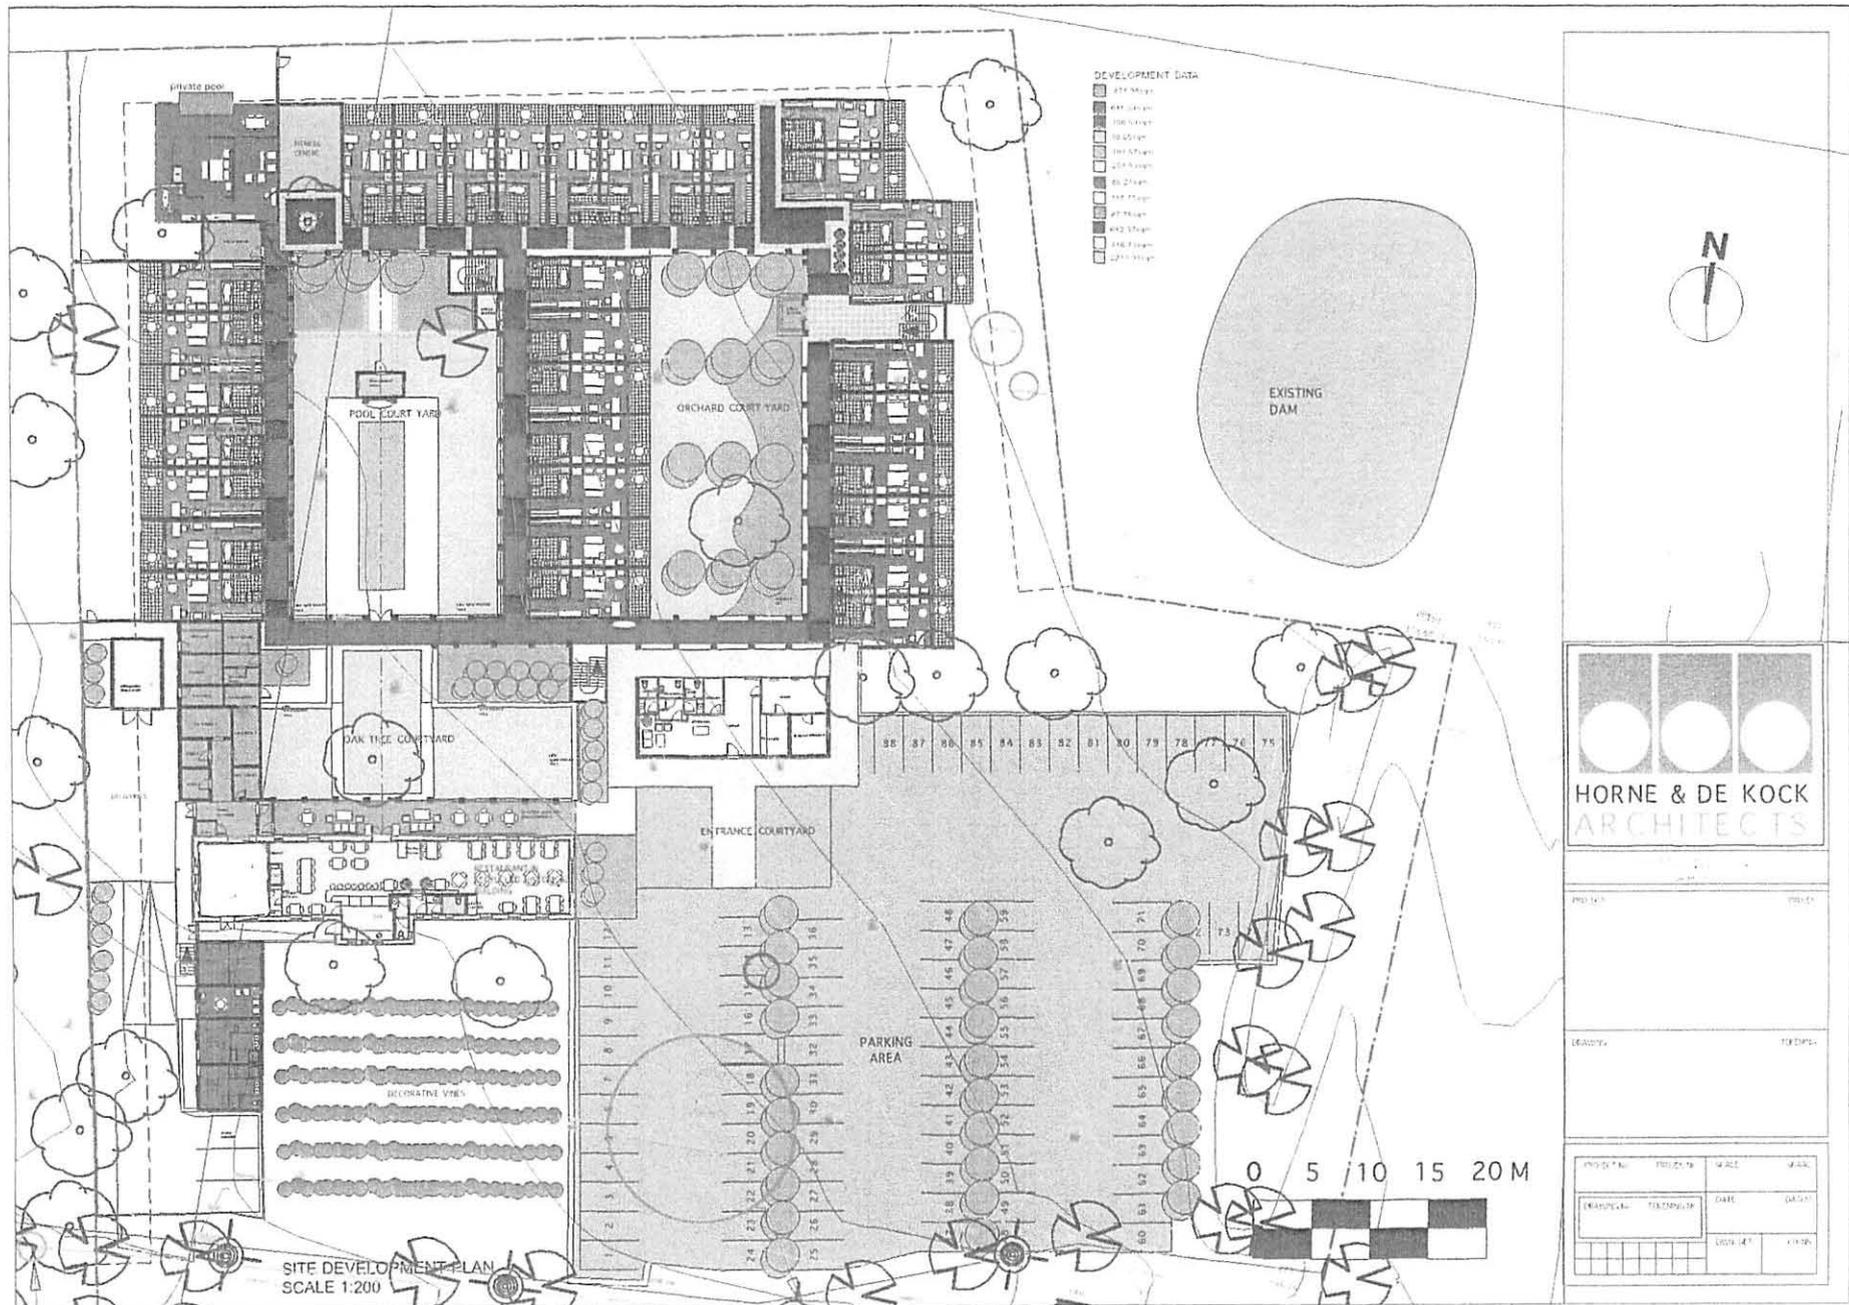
Site plan of the Patrijse Valleij, Portion Edgbaston, showing a layout of the
